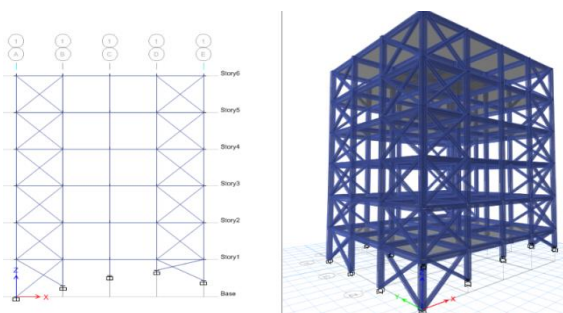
Typical plan and 3D view of Model-2 provided with Corner positioning of infill wall
